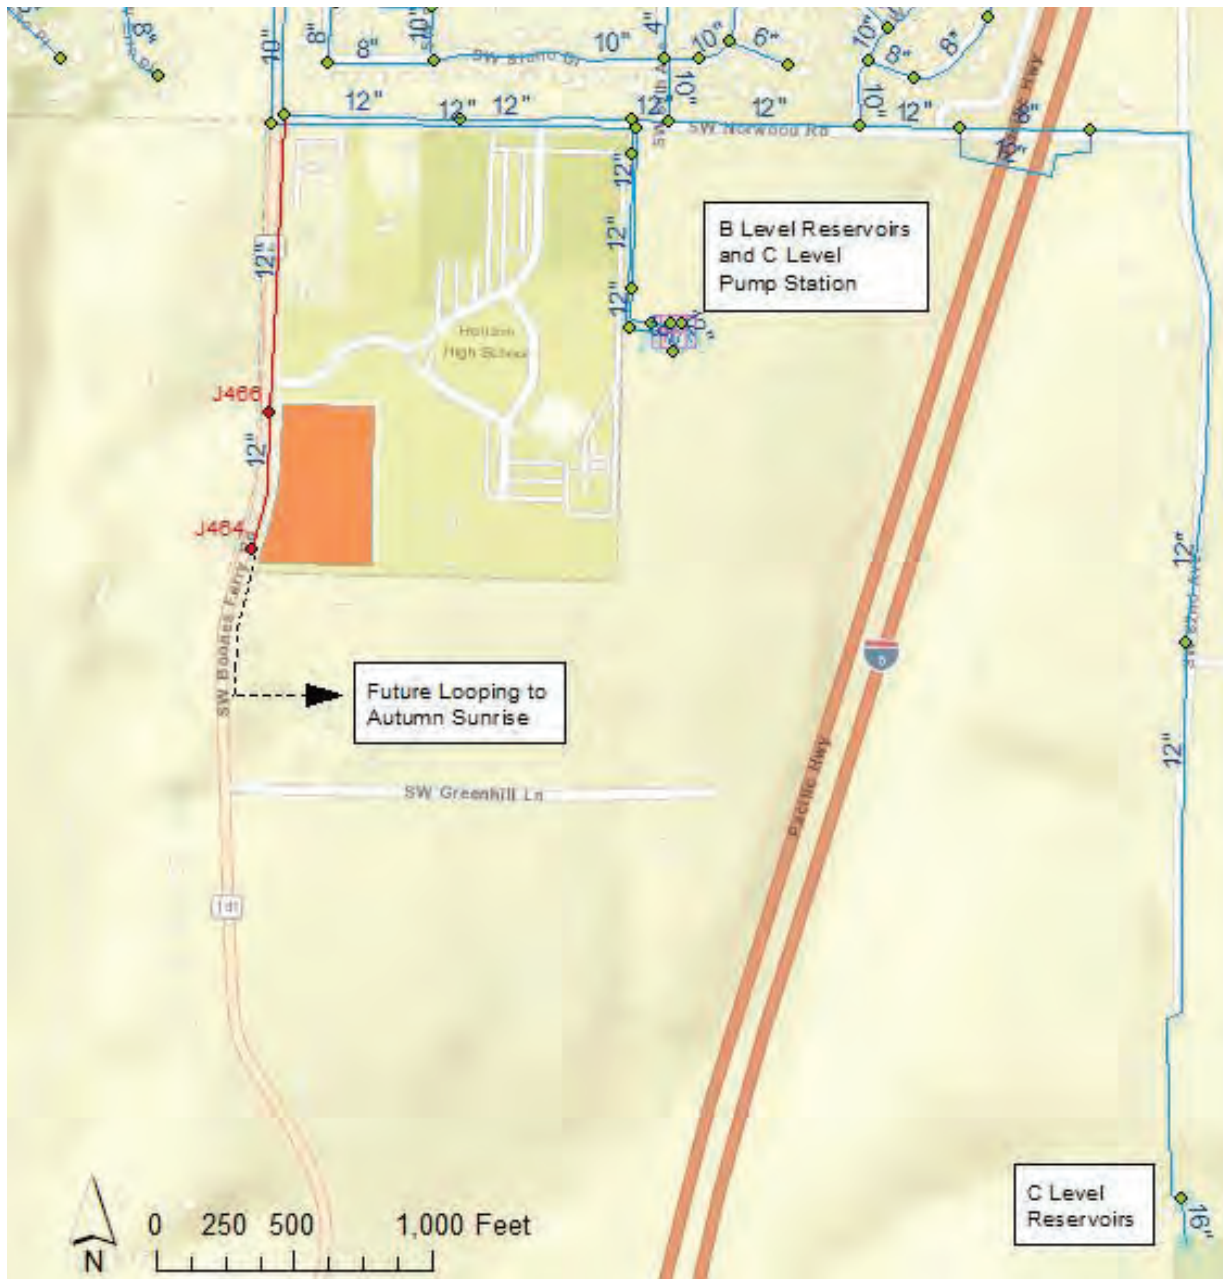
Proposed Development Site and Existing Water System Infrastructure
